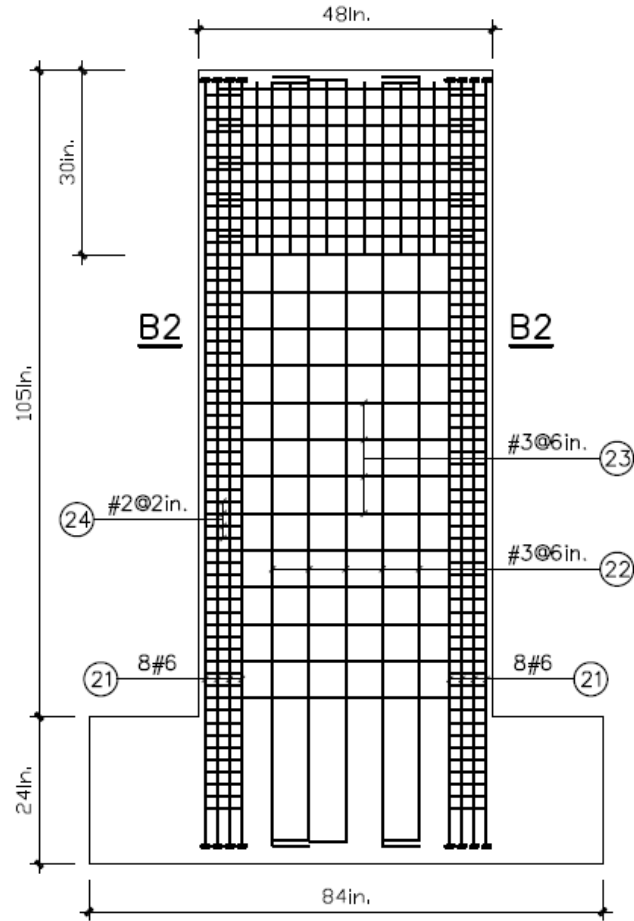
Specimen RW-A20-P10-S63 Elevation View
